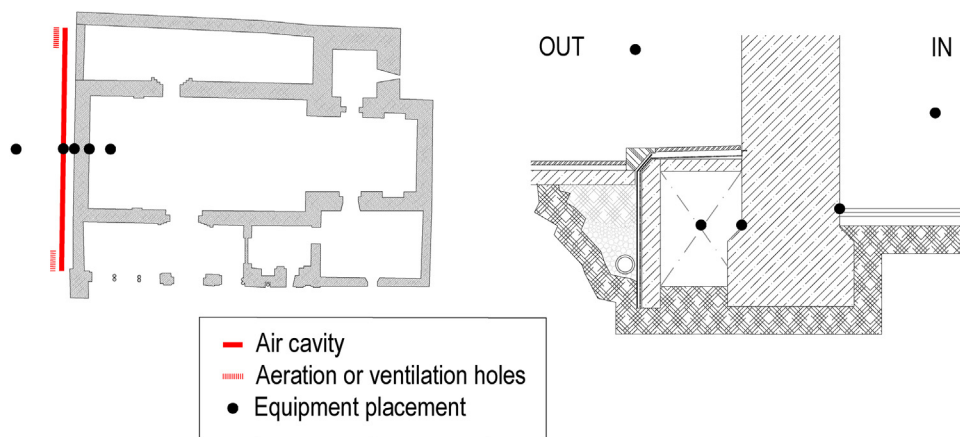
Floor plan of the location of monitoring equipment at the parish church of Pinarejos, Segovia (Sanz-Bermúdez [20], plan PR-10, floor – restored) and standard section of an air cavity.
